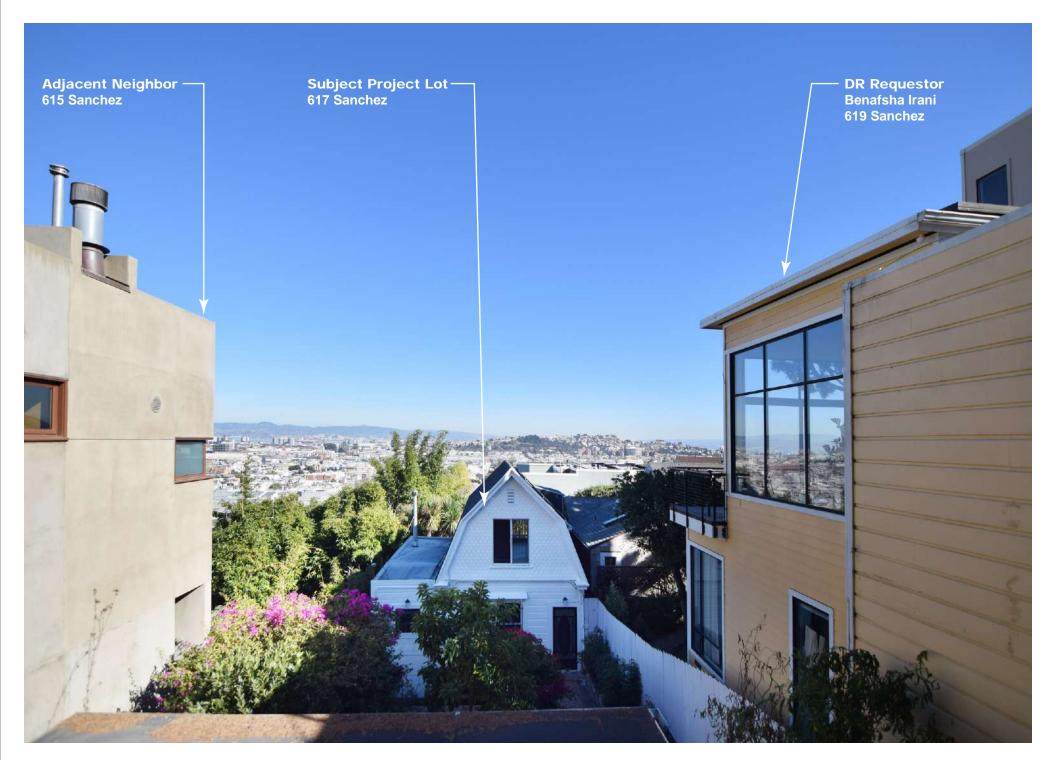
View of 617 Sanchez Street Looking East Image Date: November 6, 2018
